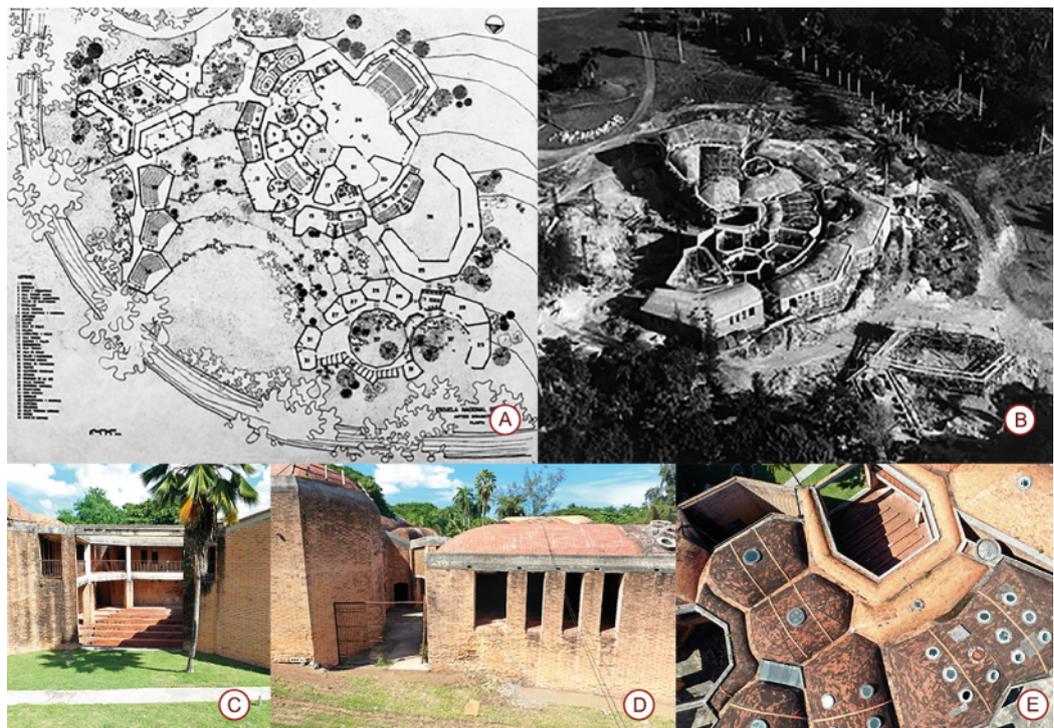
In order from left to right: original design plan (a), site photos (b), view of the interior courtyard from the main access (c), exterior view of a portion of the complex (d), aerial view of the roof system with tabicadas vaults (e).
